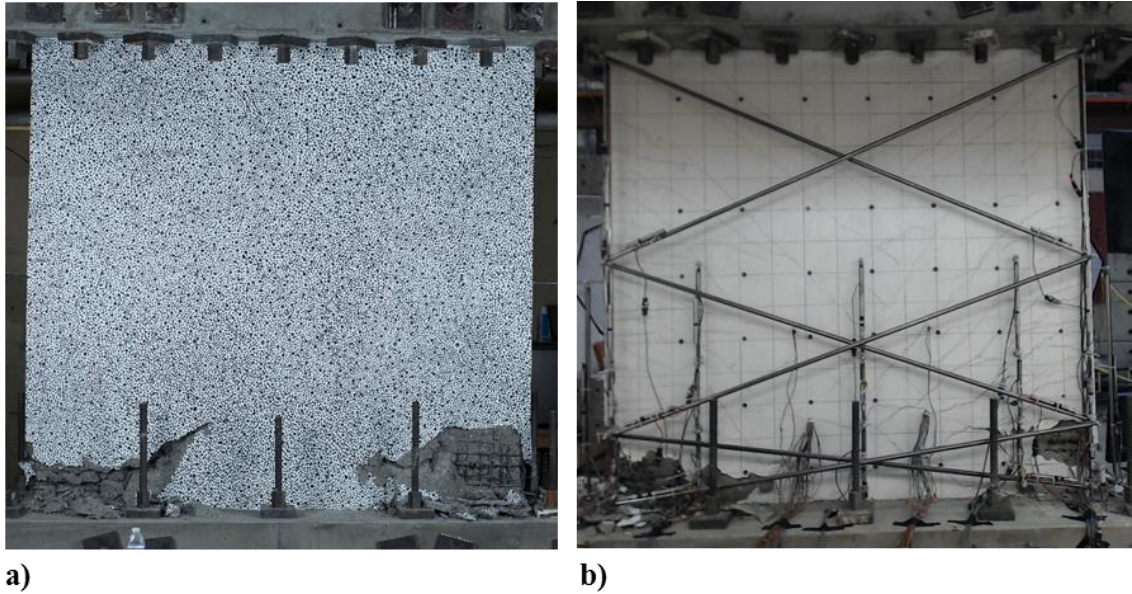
Specimen WP1 – a) Photo of front (south) face of specimen after test; and b) Photo of rear (north) face of specimen after test
